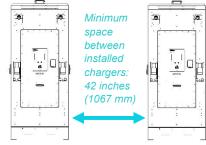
Minimum space between installed chargers is 42 inches (1067 mm)
